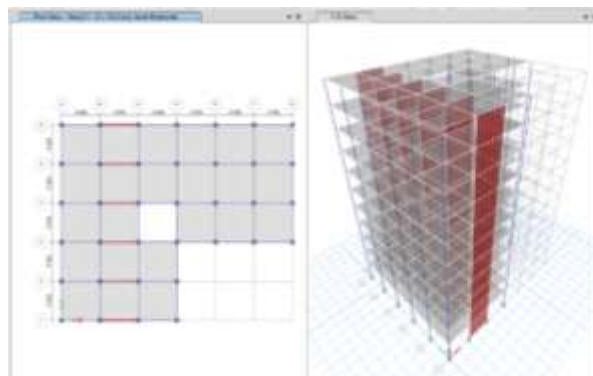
Building frame with shear wall parallel to X-direction (M3)
